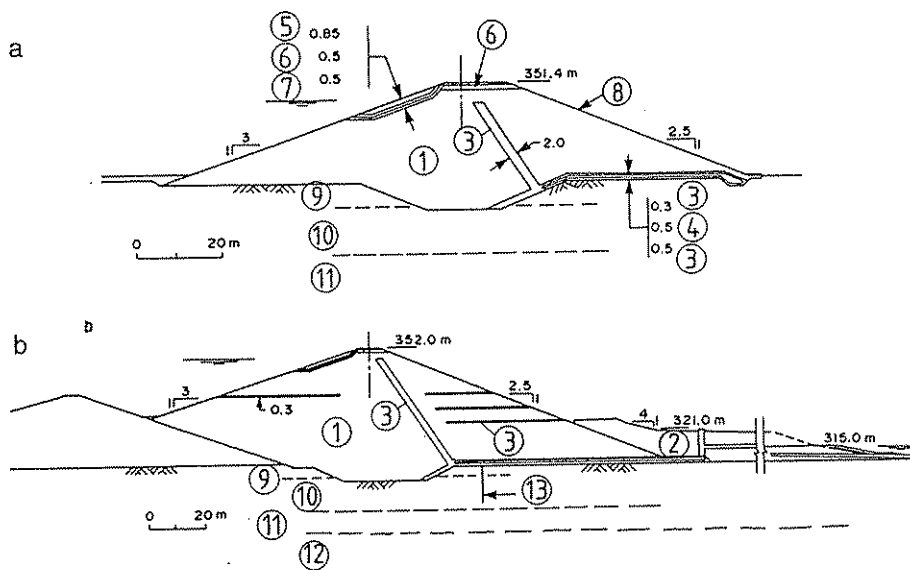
Examples of embankment dams on soil foundation, Nipawin project (adapted from Morgenstern et al. 1991).
